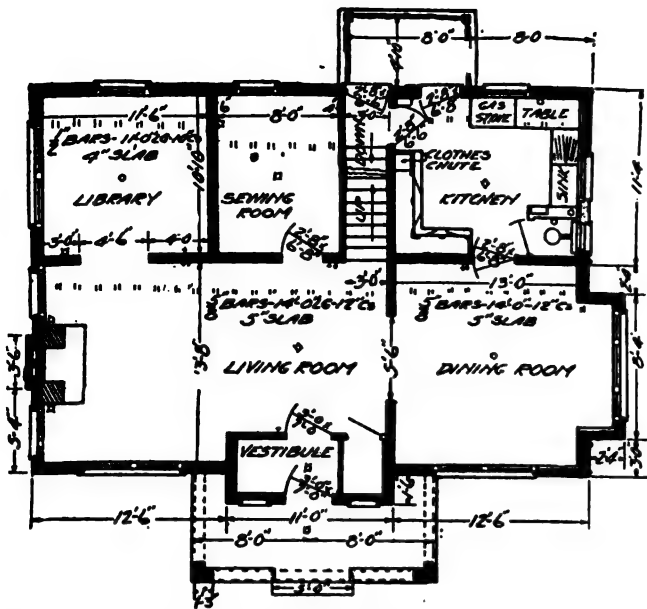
FLOOR PLANS, SHOWING STEEL USED
